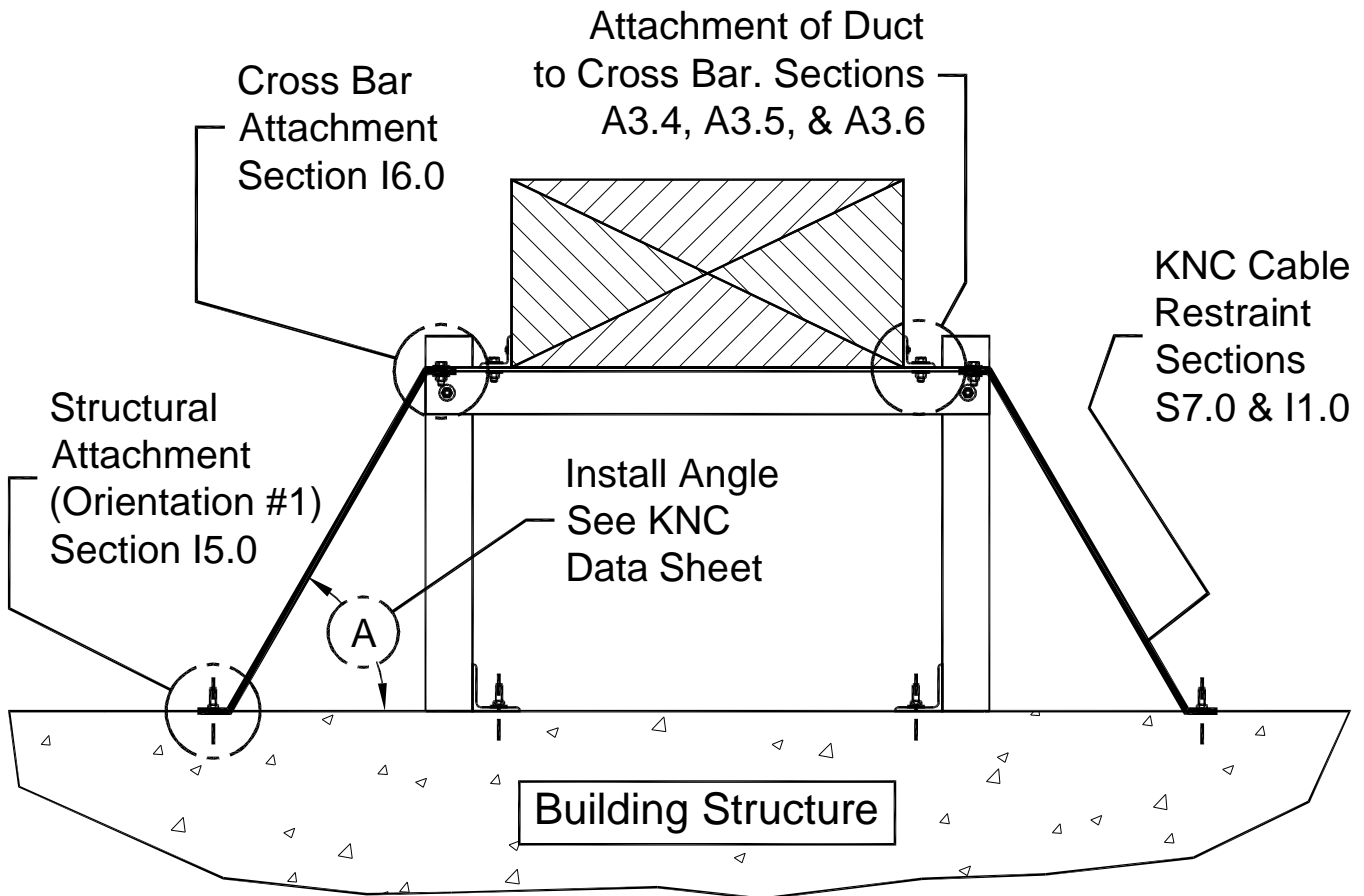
; Transverse (T) Cable Restraint Schematic Arrangement for Floor or Roof Mounted Duct – One Restraint Attached to Each Side of the Cross Bar at the Vertical Legs and Directed Outward from the Floor Stand
